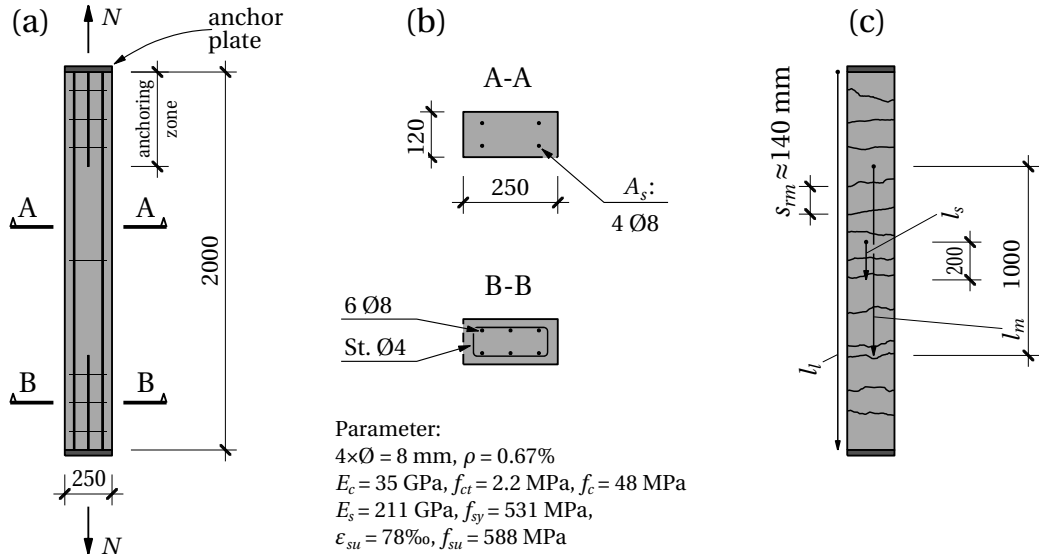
(a) Longitudinal section of Pfyl's beam T100.0 with placed reinforcement (dimensions in mm), (b) cross sections A–A and B–B, (c) crack pattern and installed LVDT sensors (adapted from Pfyl and Marti 2001)
